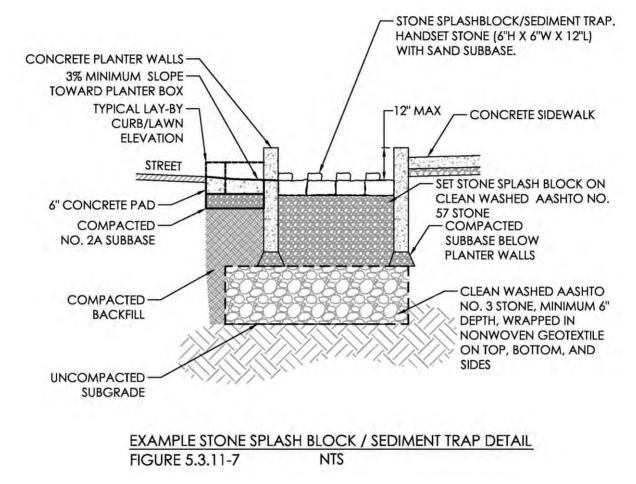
Example of the entrance conditions into a streetside planter box (cross-section A-A').
